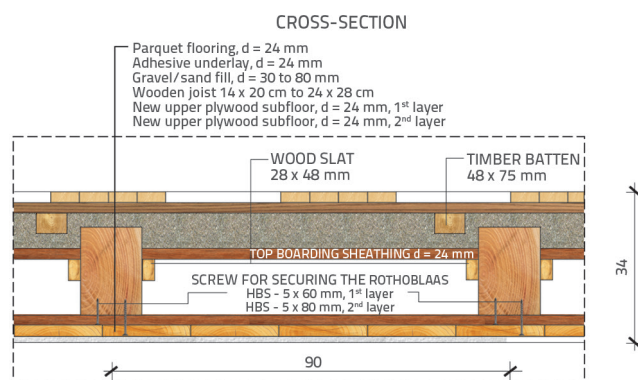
Strengthening of a floor structure with traditional timber beams and recessed infill by panel stiffening from the underside of the beams
